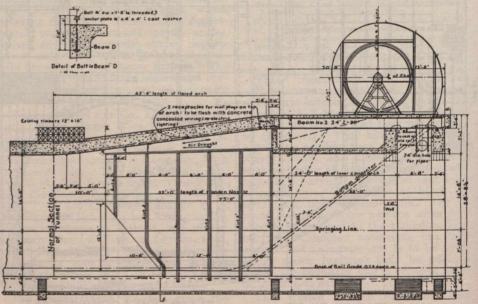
Connaught Tunnel Ventilation, Longitudinal Section.
